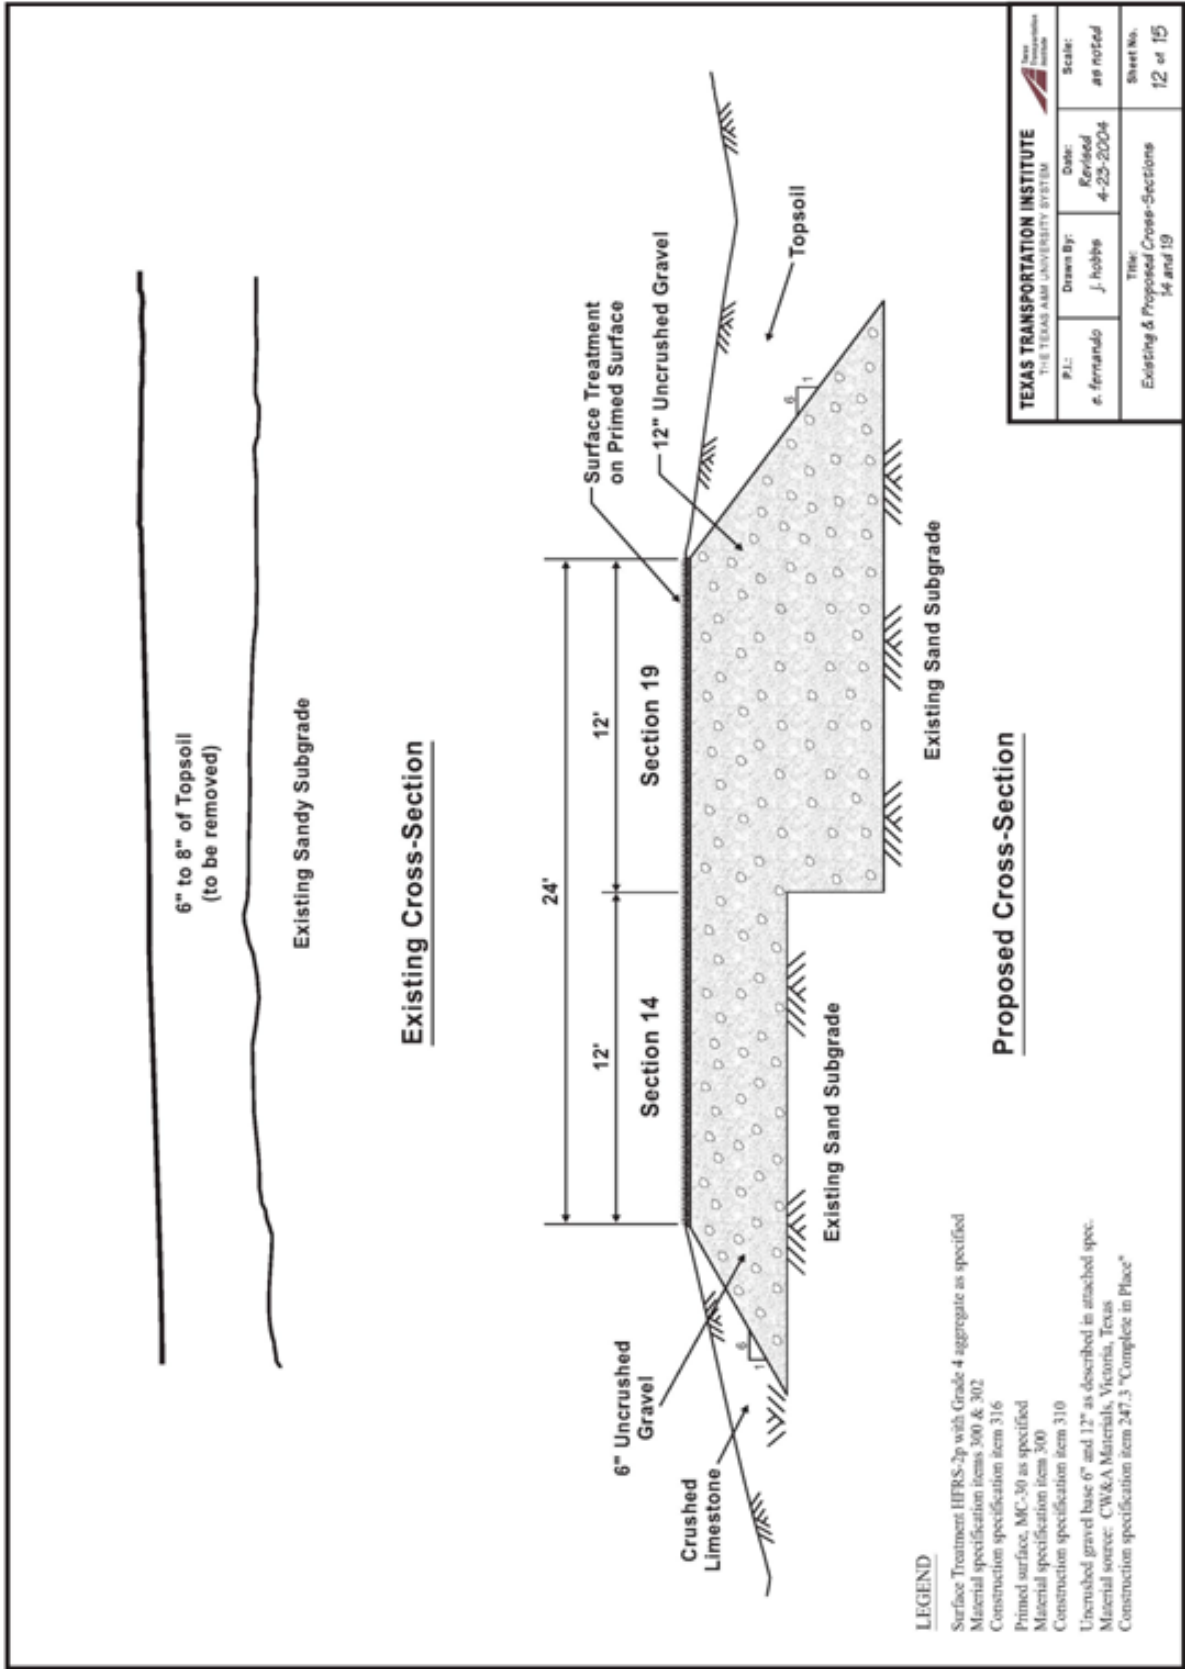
Existing and Proposed Cross-Sections for Sections 14 and 19.
